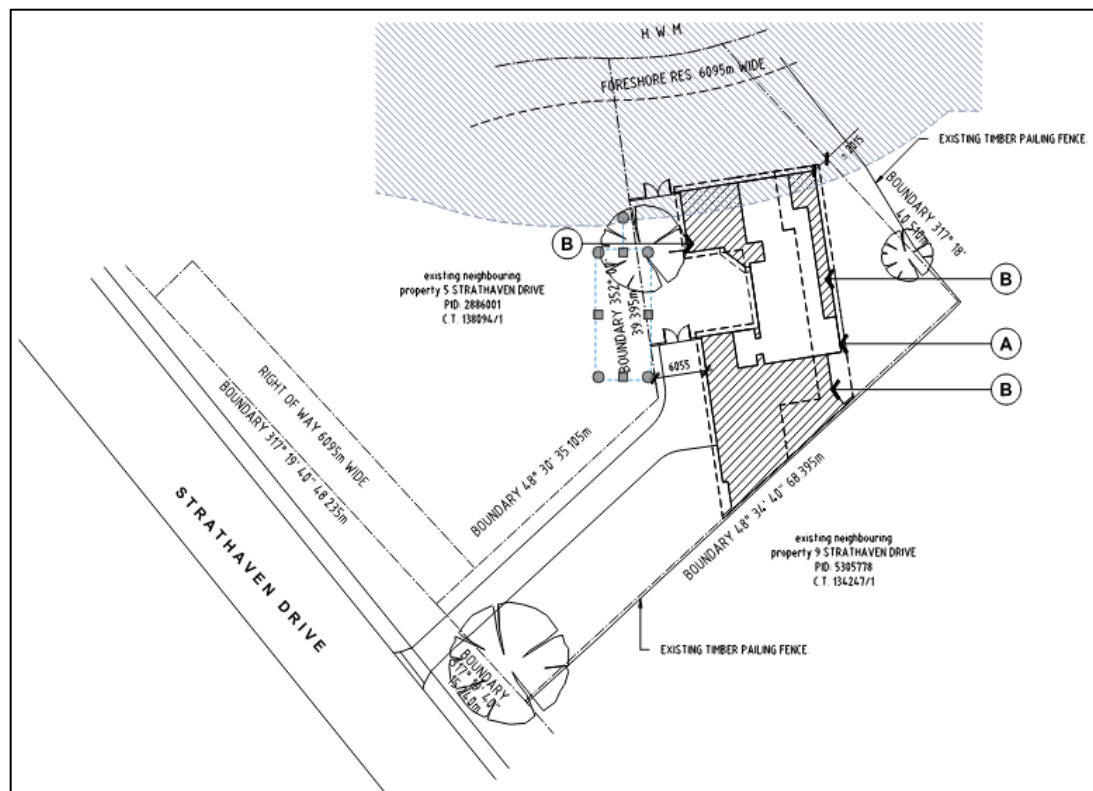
Site plan of proposal at 7 Strathaven Drive, Rosetta
